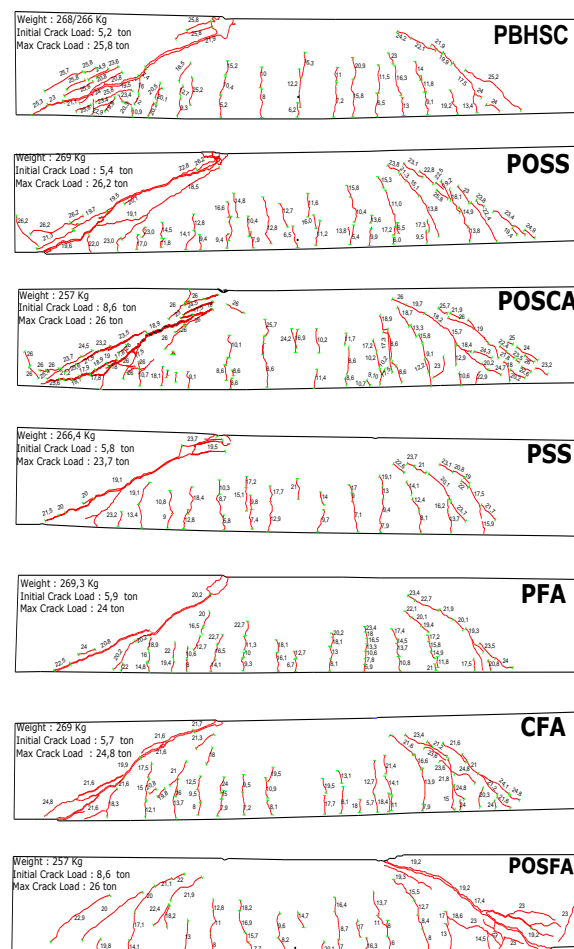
Failure pattern of high-strength reinforced concrete beams.
